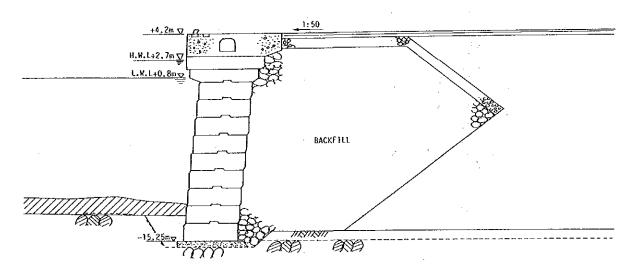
(2) Existing Quay Wall (Berth No.1, No.2)
